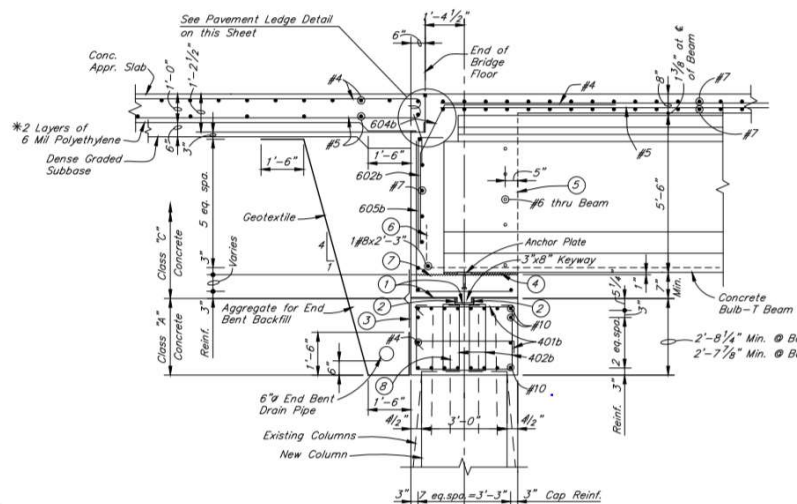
Abutment Detail of the Bridge (NBI 18790) (2014)
